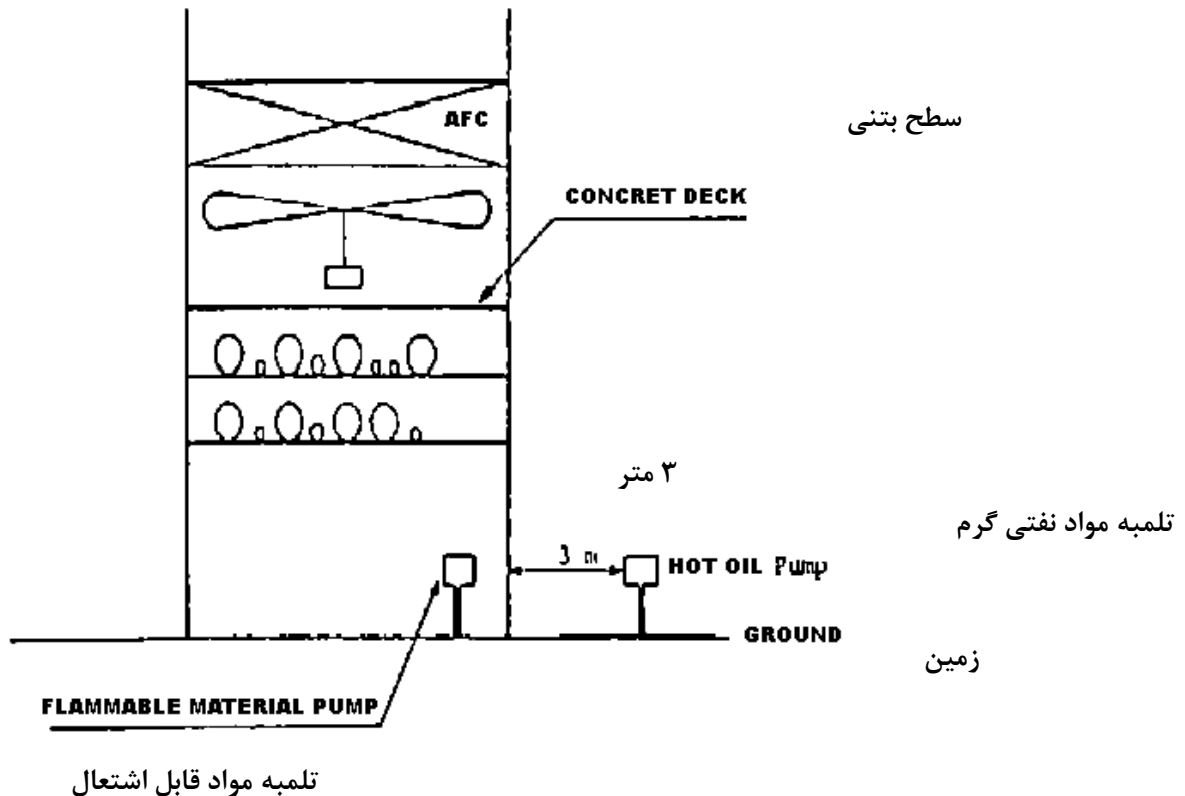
LAYOUT OF FLAMMABLE MATERIAL PUMPS
